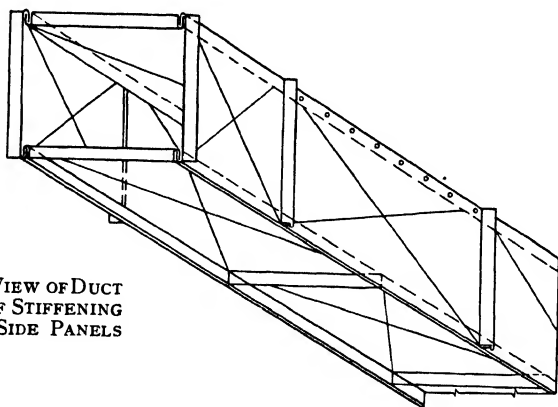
ISOMETRIC VIEW OF DUCT SHOWING LOCATION OF STIFFENING SEAMS ON TOP AND SIDE PANELS OF DUCT
